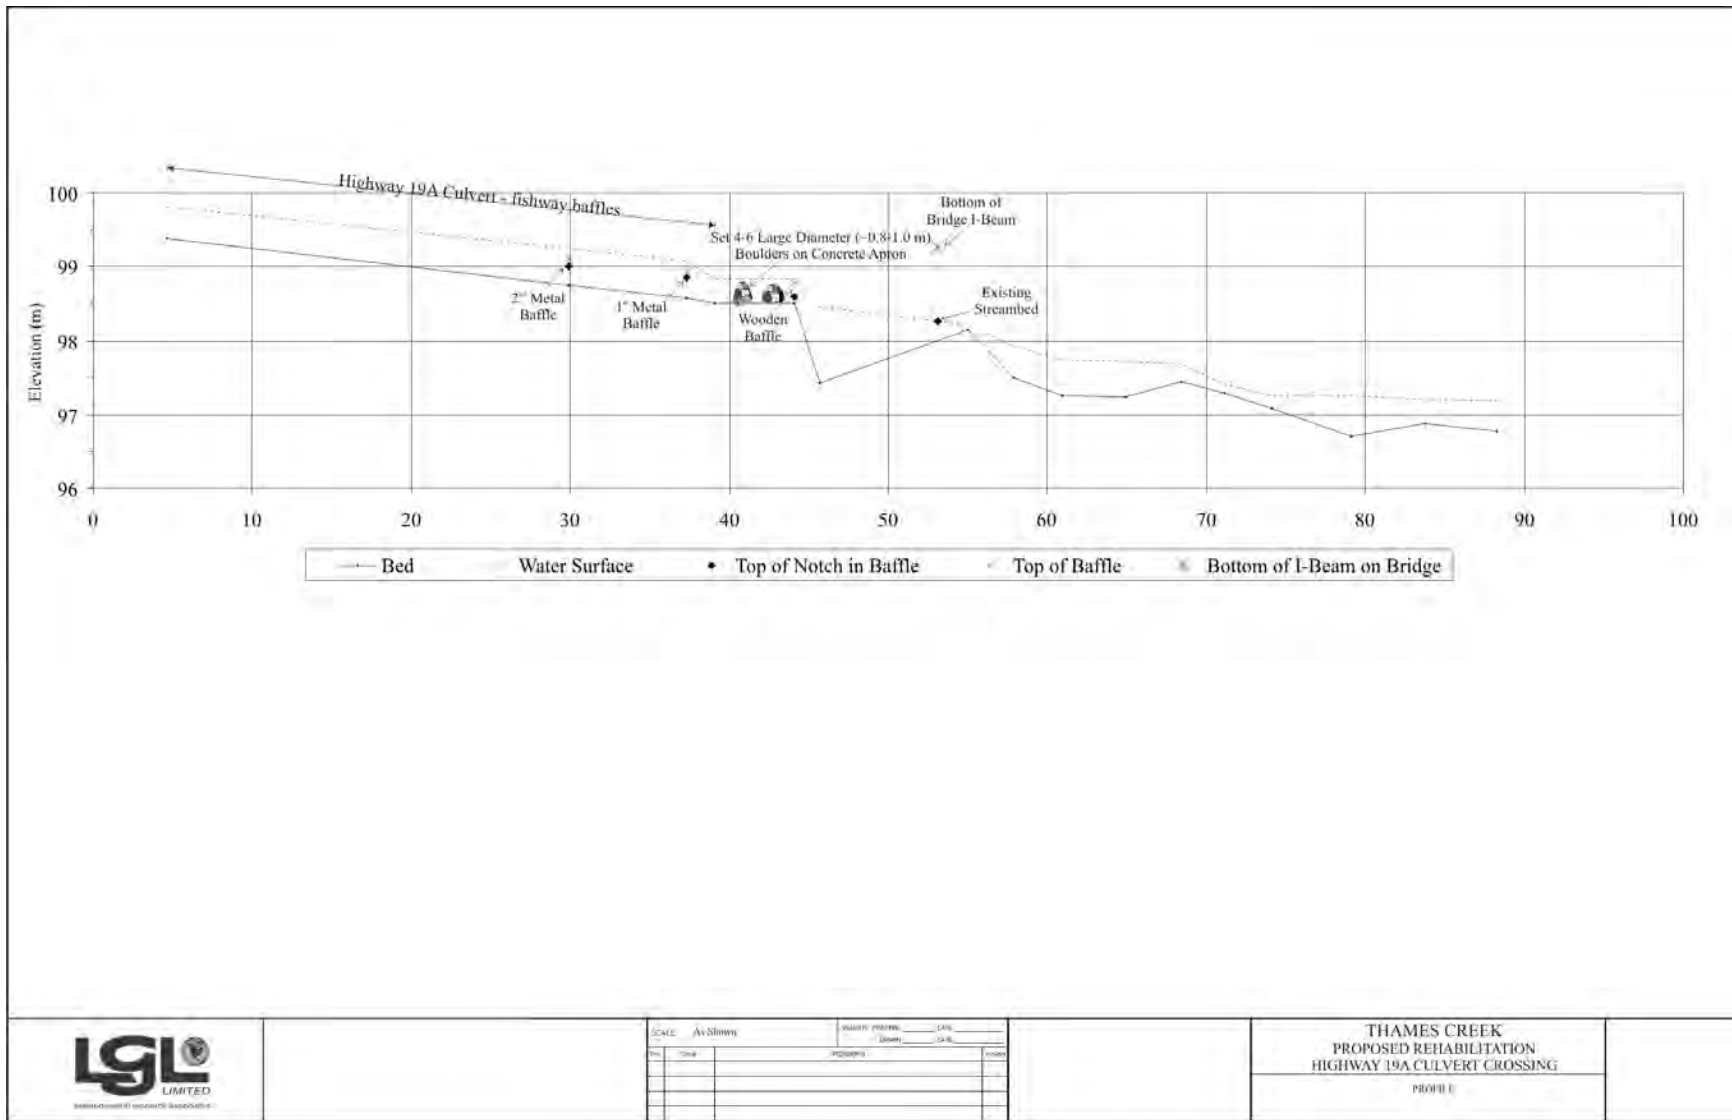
Profile of Thames Creek showing proposed boulder placement on the downstream side of the Highway 19A culvert.
